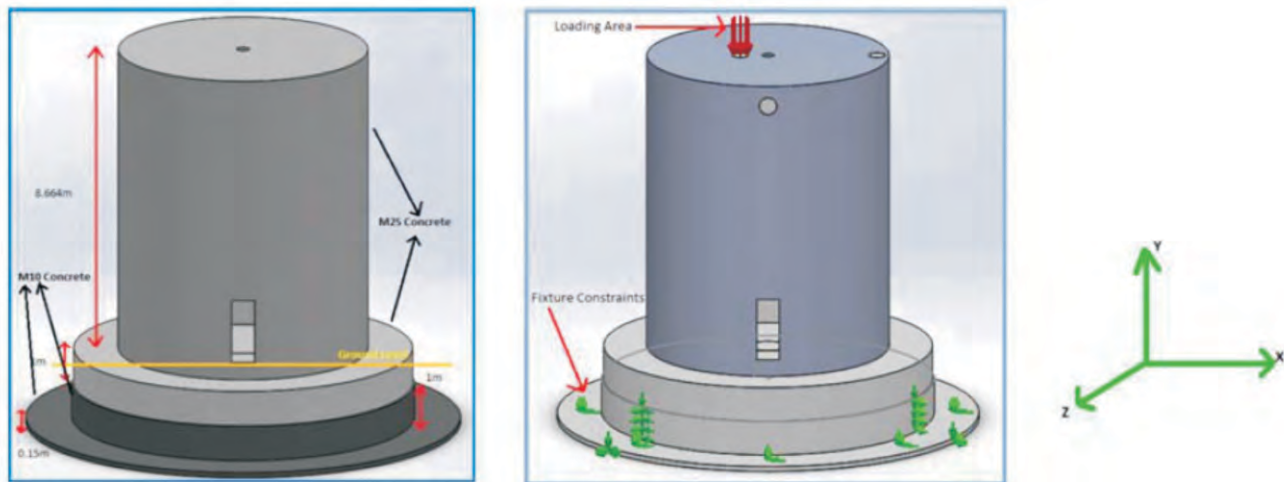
A- pier model as constructed, B- loaded telescope pier for impacting, C- the coordinate system used.
